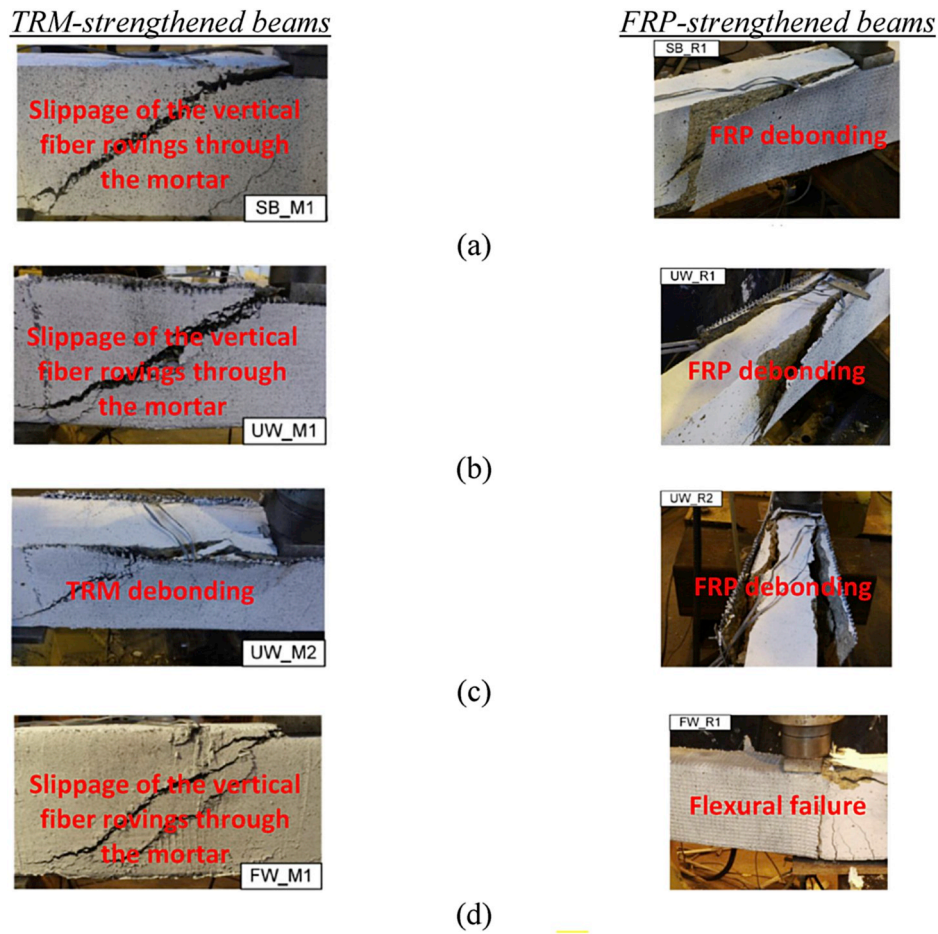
Failure modes of beams tested by Tetta et al. [93]: (a) 1 layer of side-bonded jacket; (b) 1 layer of U-jacket; (c) 2 layers of U-jacket; (d) 1 layer of fully wrapped jacket.
